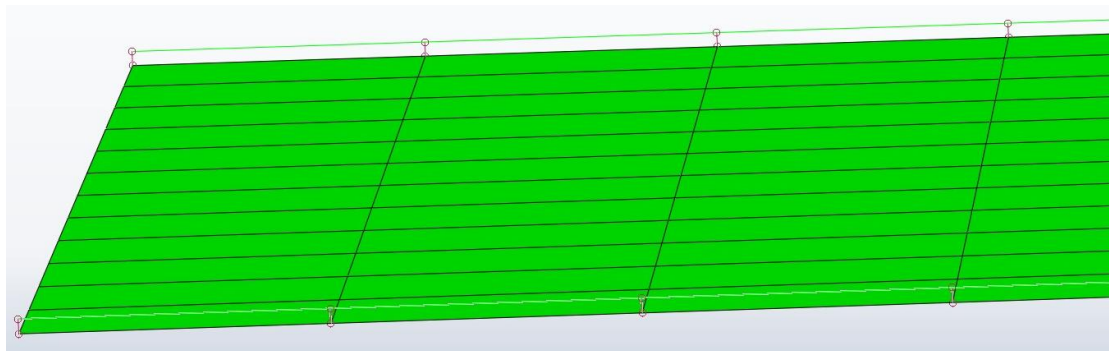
Tie connection between edge beam and bridge deck. Picture from BRIGADE/Plus.
